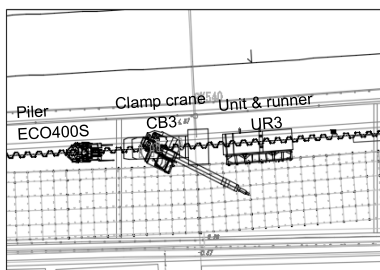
shows the layout of Koshin site. Sheet piles were constructed over 240 m along the railway. The distance between the center of the nearest rail track and the planned sheet pile center was 4.5 m. A working platform had been constructed having length of 180 m and width of 4 m. The border of the platform was located at 1.5 m from the neighbor's housing structures.
